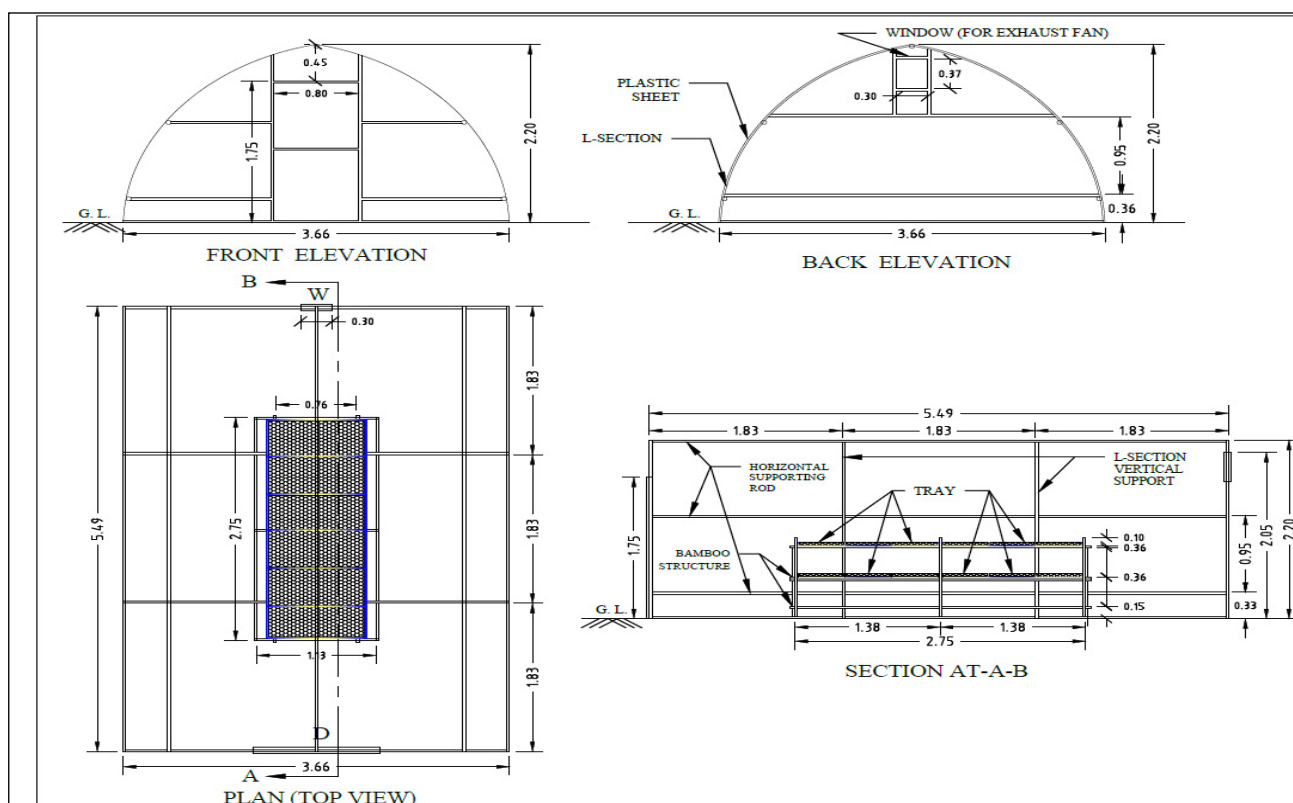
Schematic diagram of solar dryer for grape drying (Front Elevation, Back elevation, Top view and Side view)
